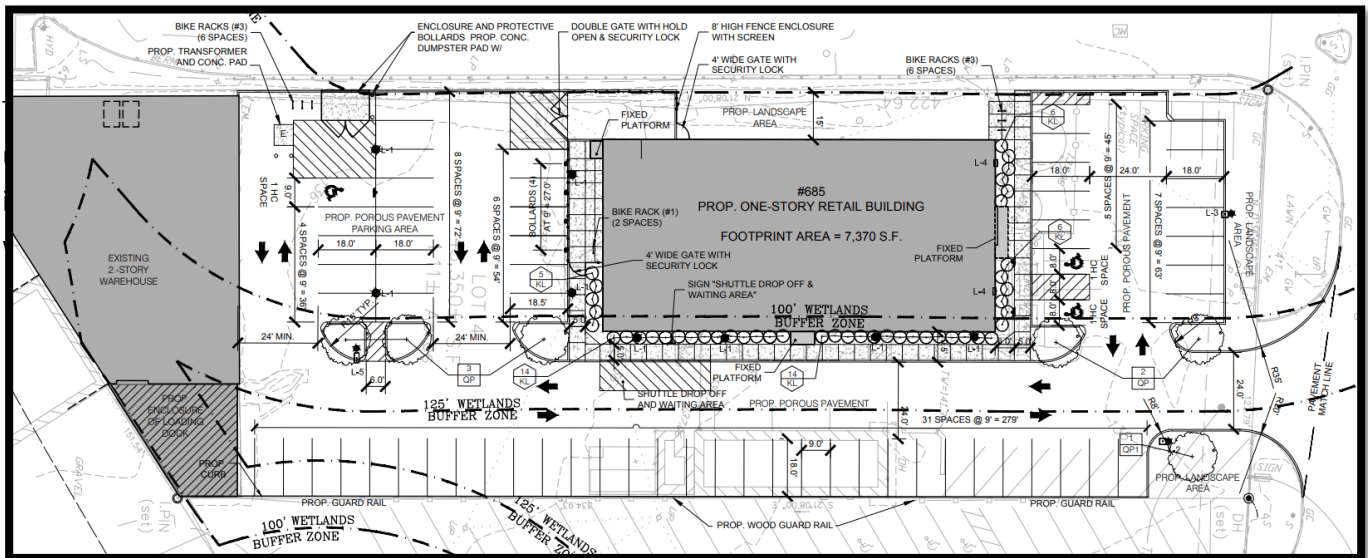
(Proposed site plan and parking detail previously approved by Framingham Planning Board)
